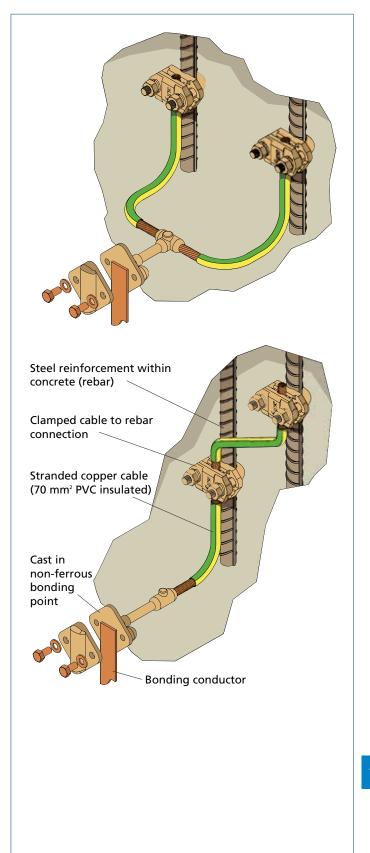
Typical methods of bonding to steel reinforcement within concrete
